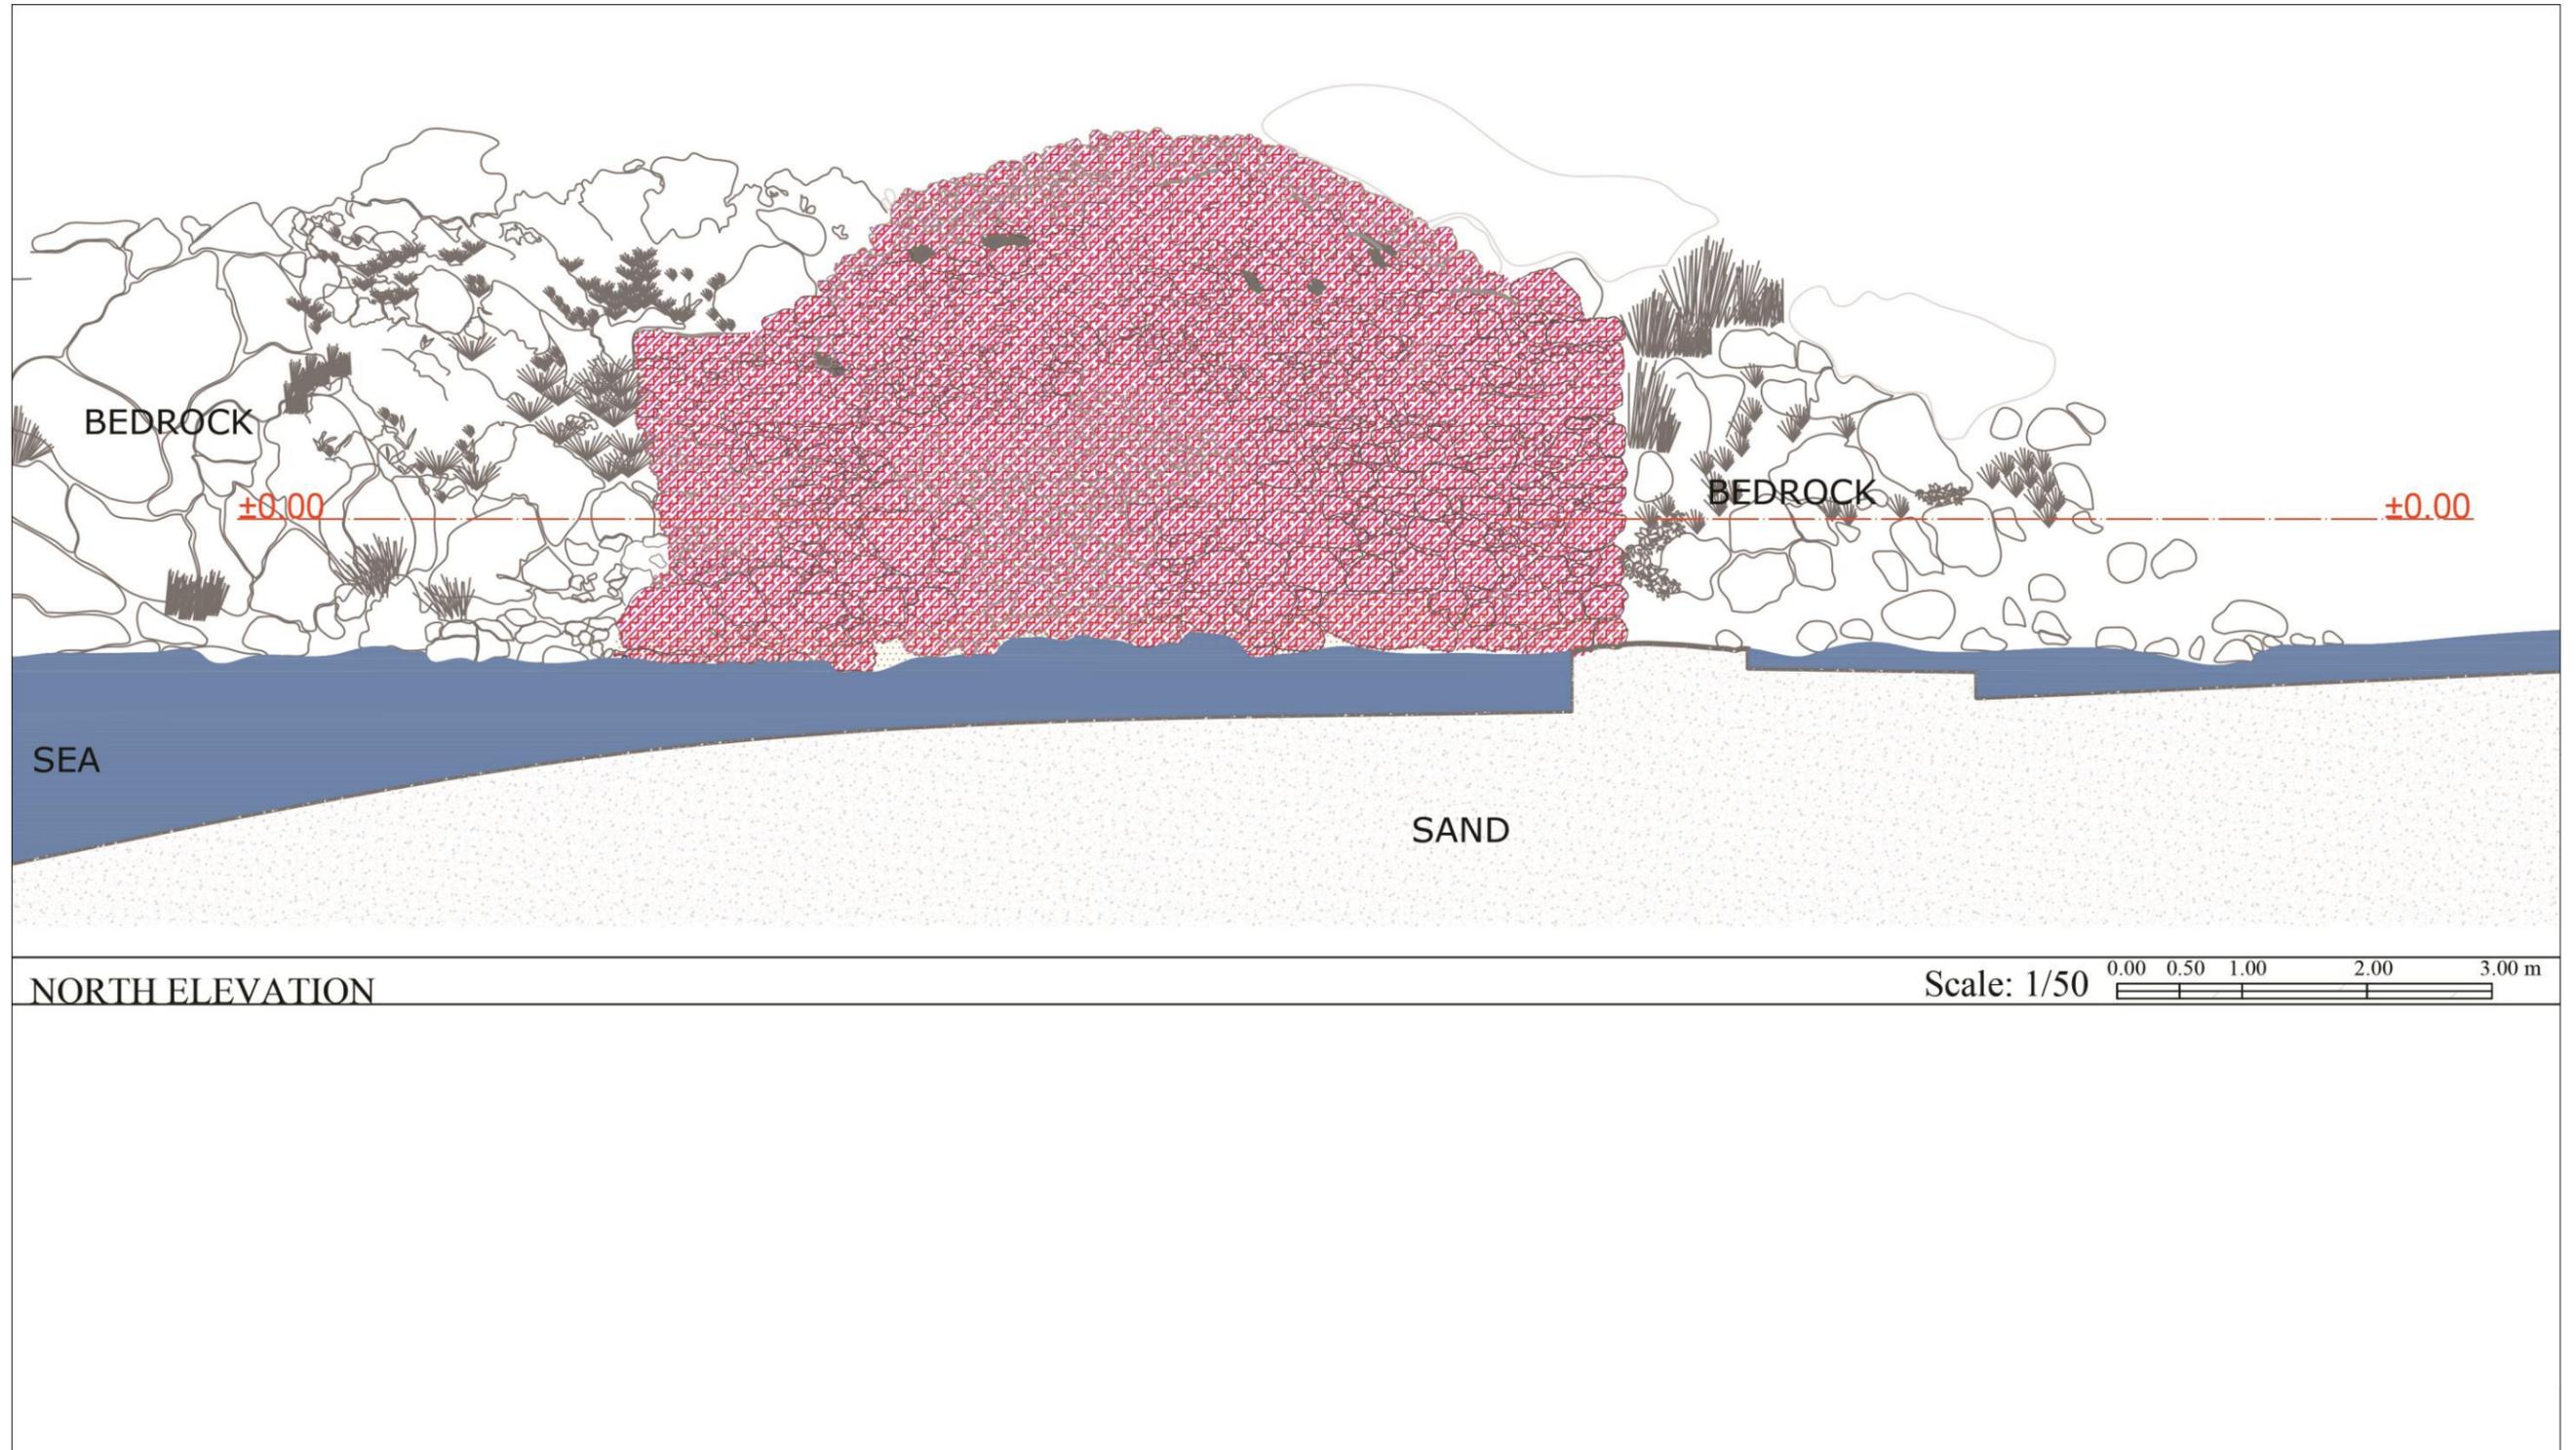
North Elevation-Structural Failures and Material Deterioration
